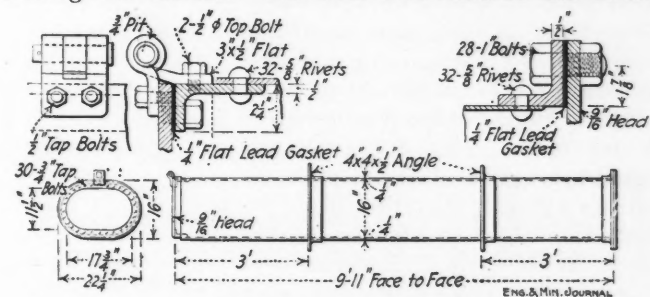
MANWAY TUBE THROUGH THE CONCRETE
